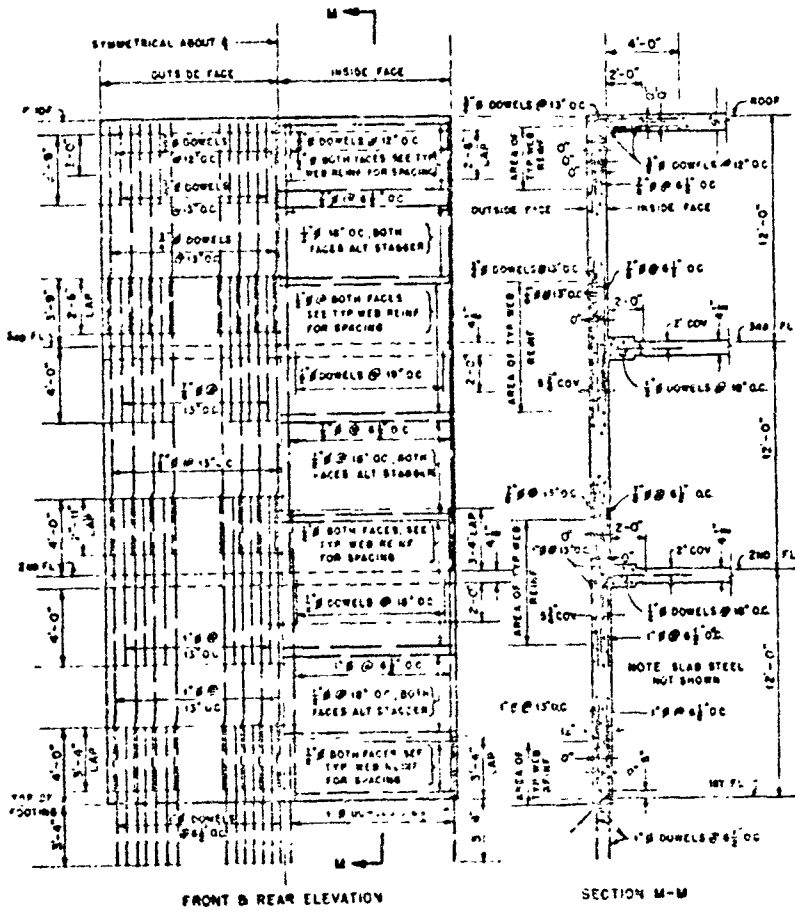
Front and rear elevations and wall details, Building 3.
